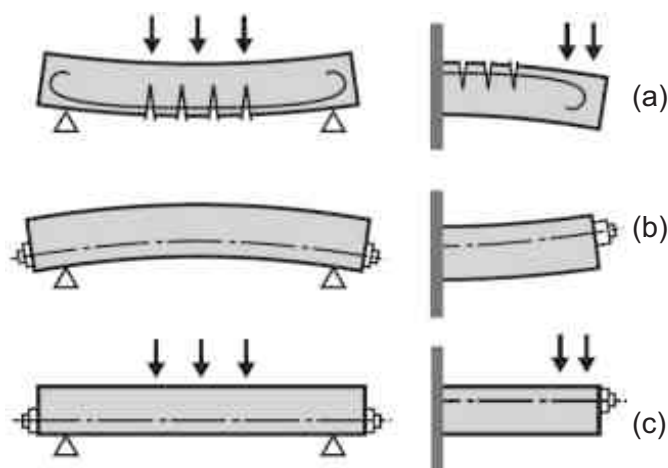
Behaviour of beams/plates of reinforced concrete and prestressed under load
